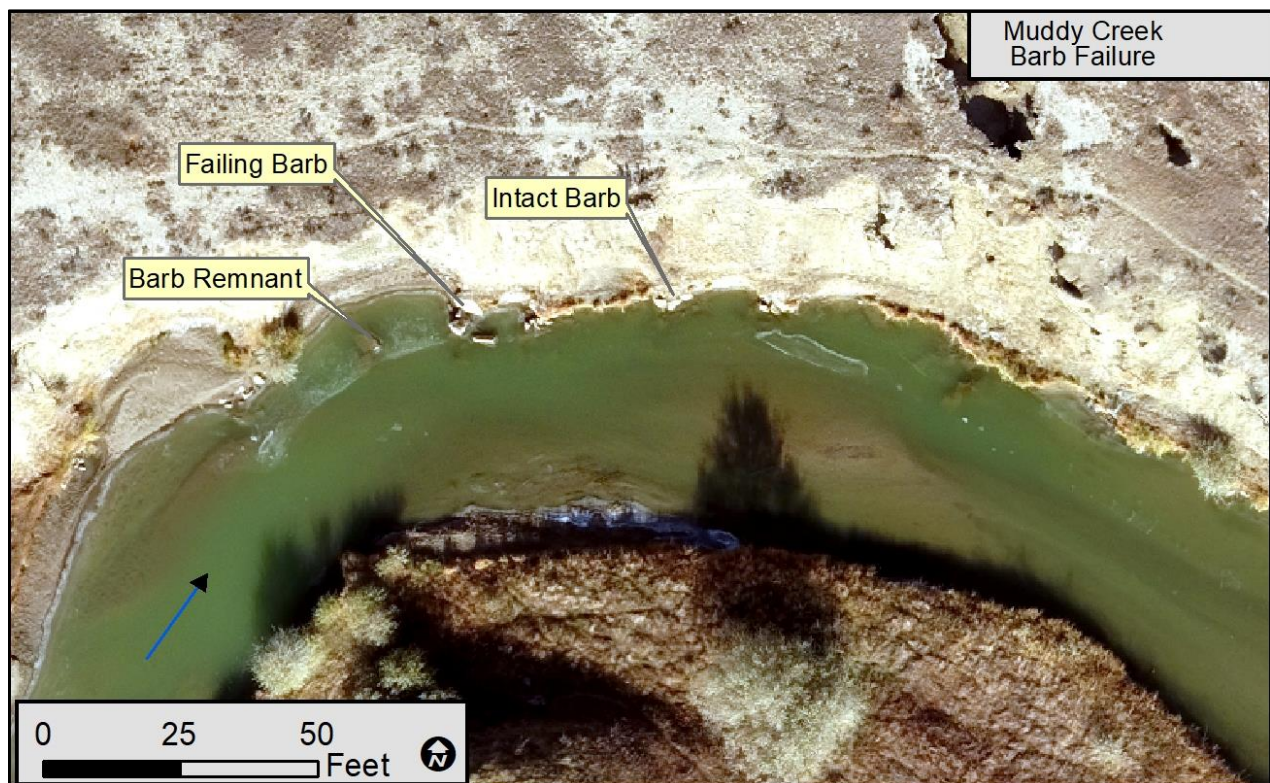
Barbs constructed at toe of high bank showing local failures.
